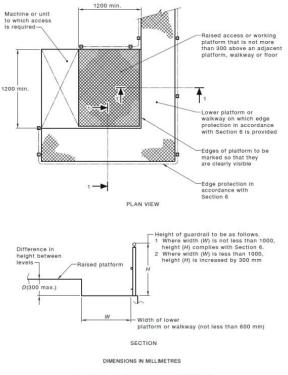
GUARDRAILS ON PLATFORMS
